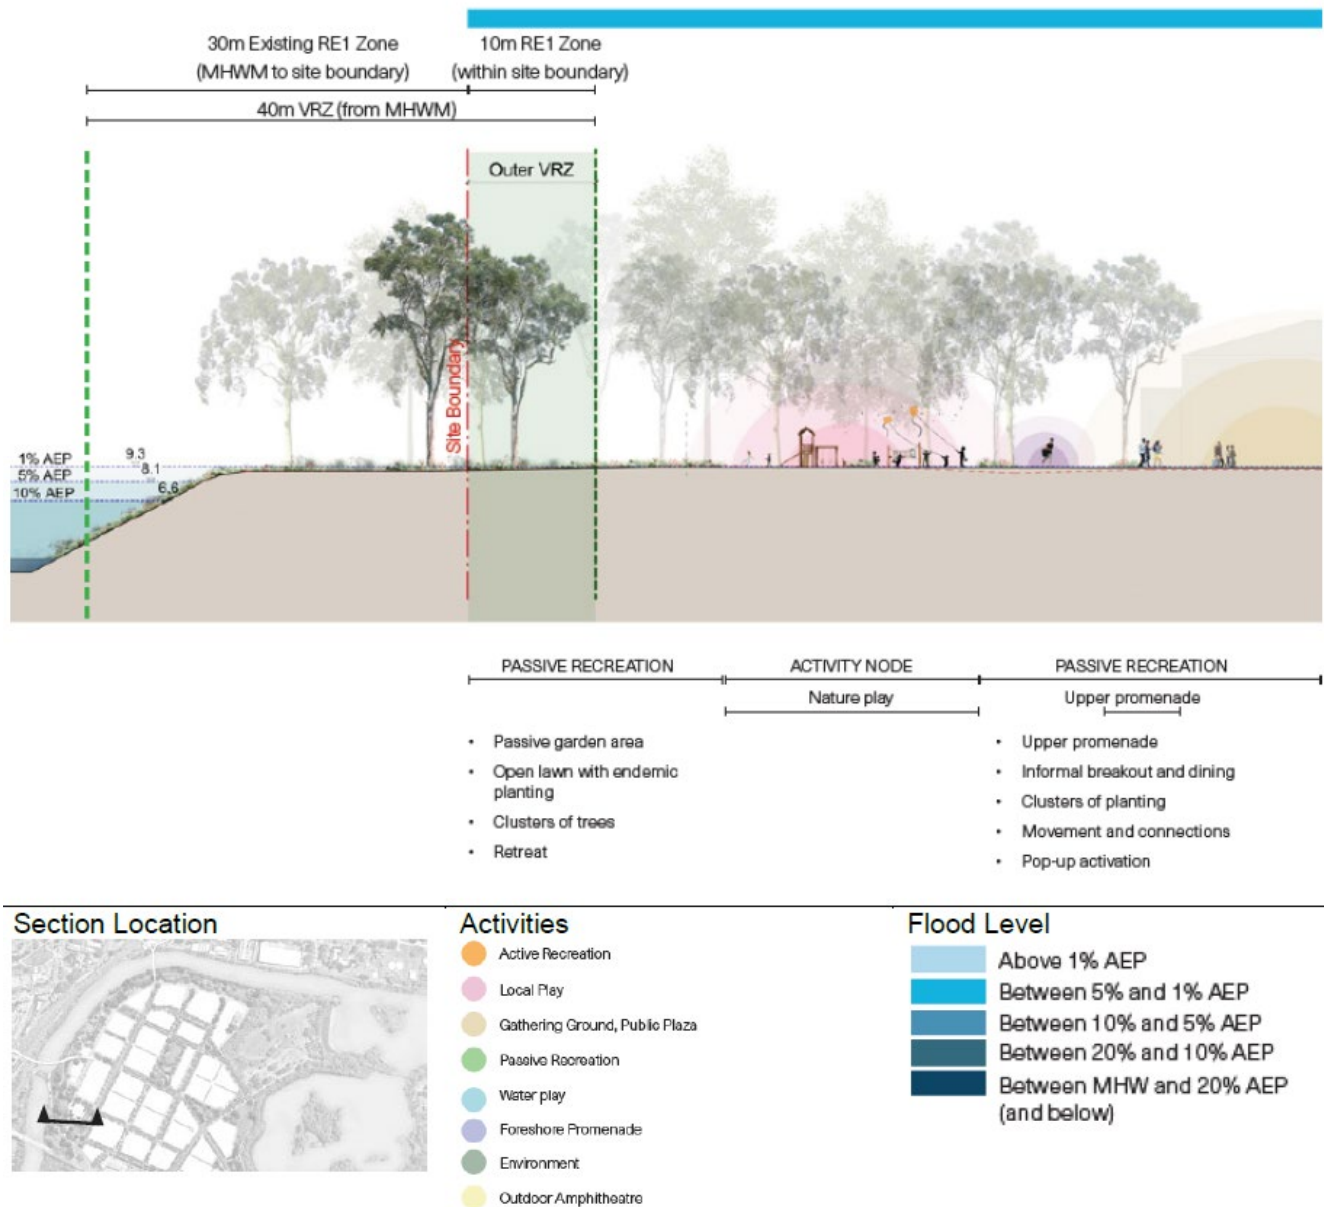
Example of Foreshore Section - City Gateway Village Section 1
